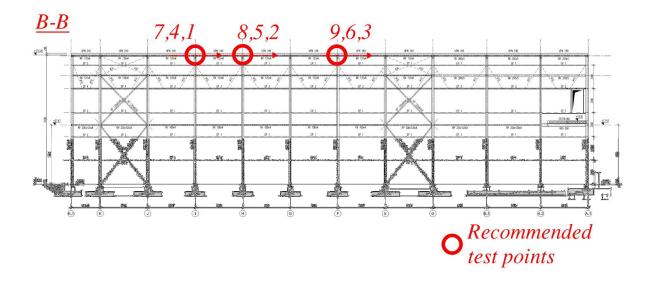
Examples of recommended testing points in a slender roof structure, at cross section B-B (see Figure 4.3).
